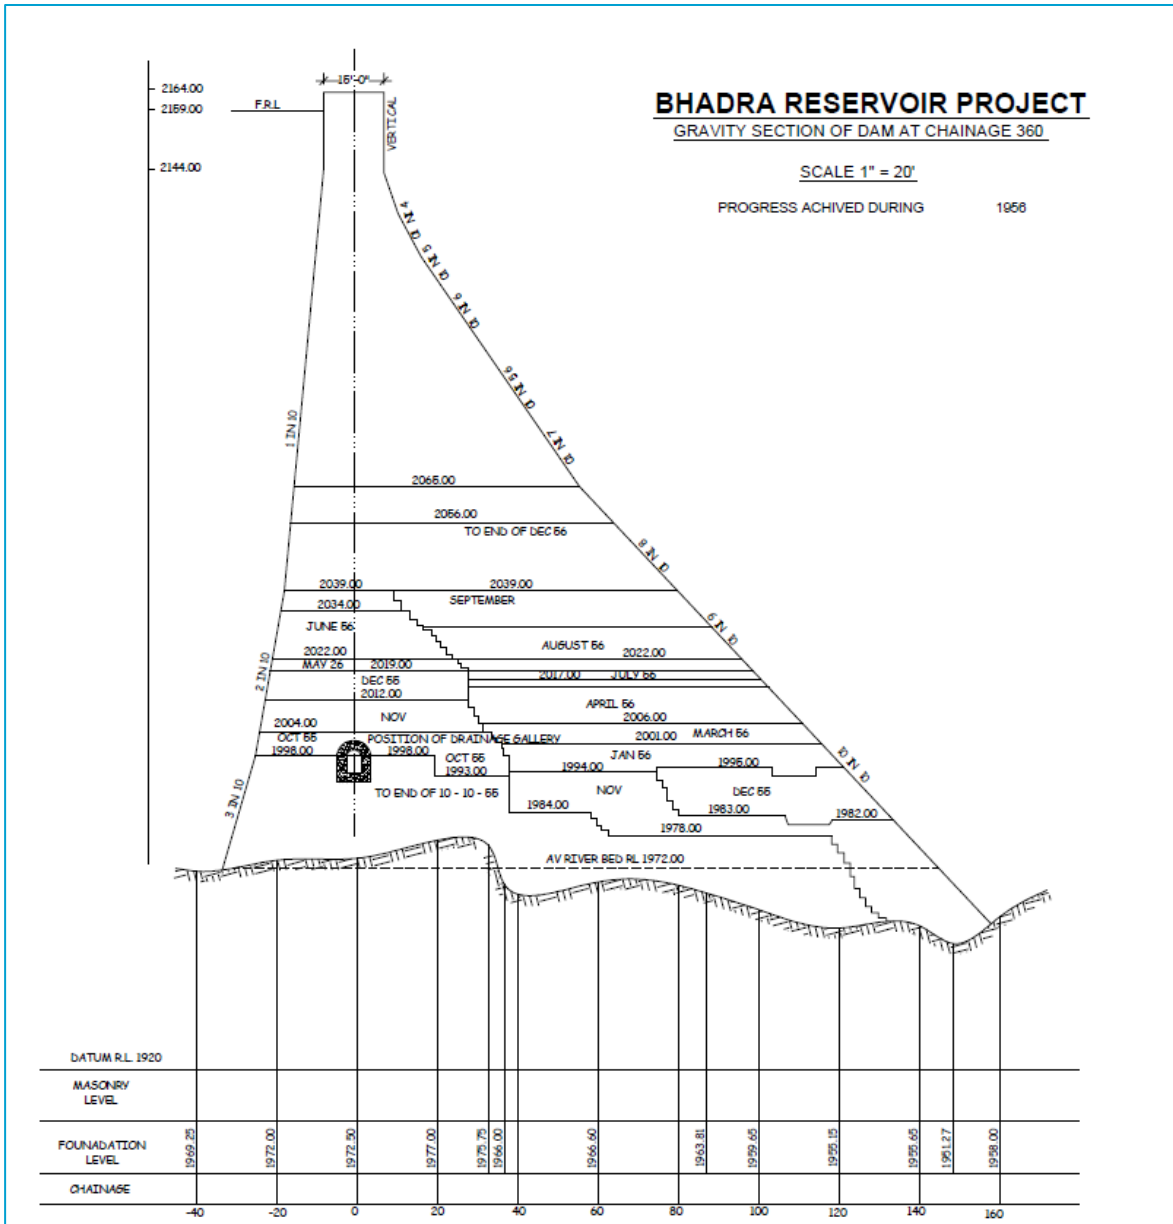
Dam body cross section of Bhadra Dam. Source: Bhadra reservoir project.
